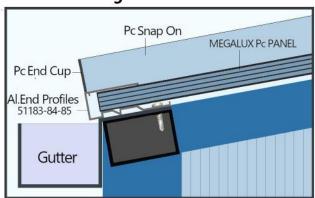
DETAIL OPTIONS for INSTALLATION of MEGALUX Pc PANEL & Pc SNAP ON
